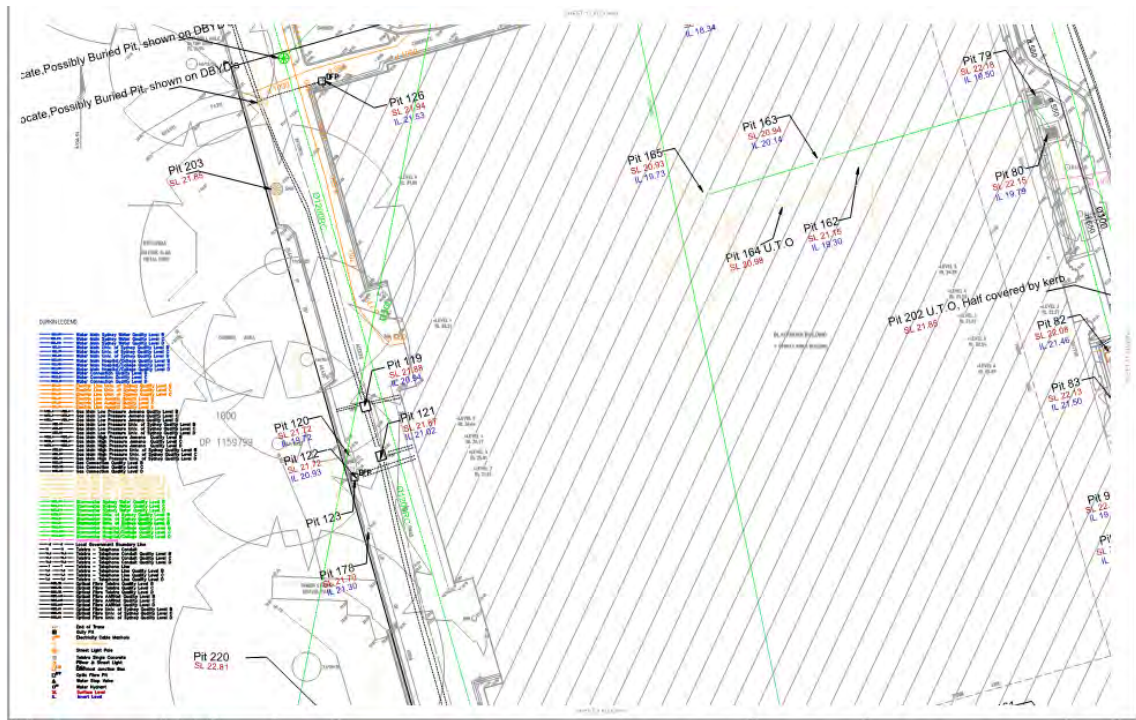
Site Survey – North side of Site (Source: RPS Sheet 10)
